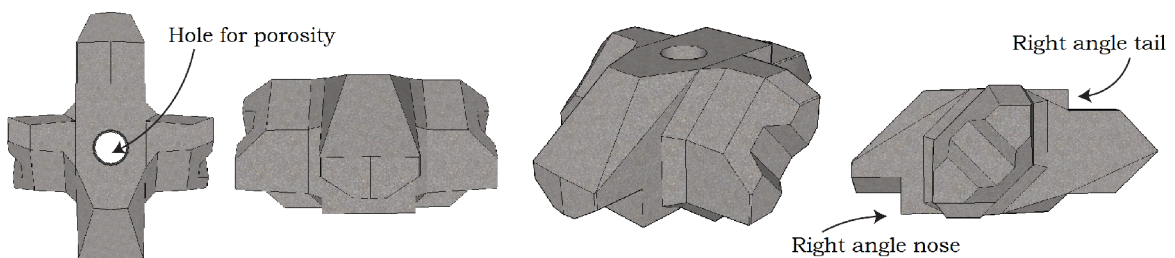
Shape of Xbloc<sup>Plus</sup>, f.l.t.r. top view, front view, isometric view and side view
